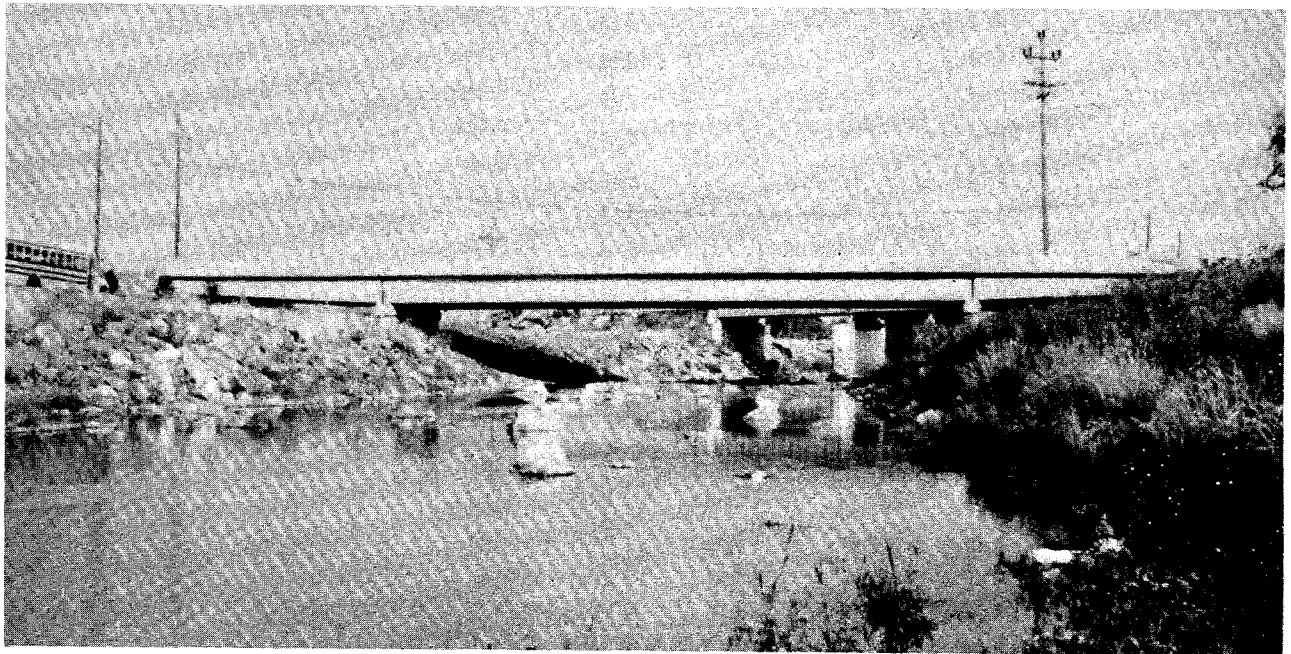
Downstream view of new SR-82 bridge. Note rock riprap
